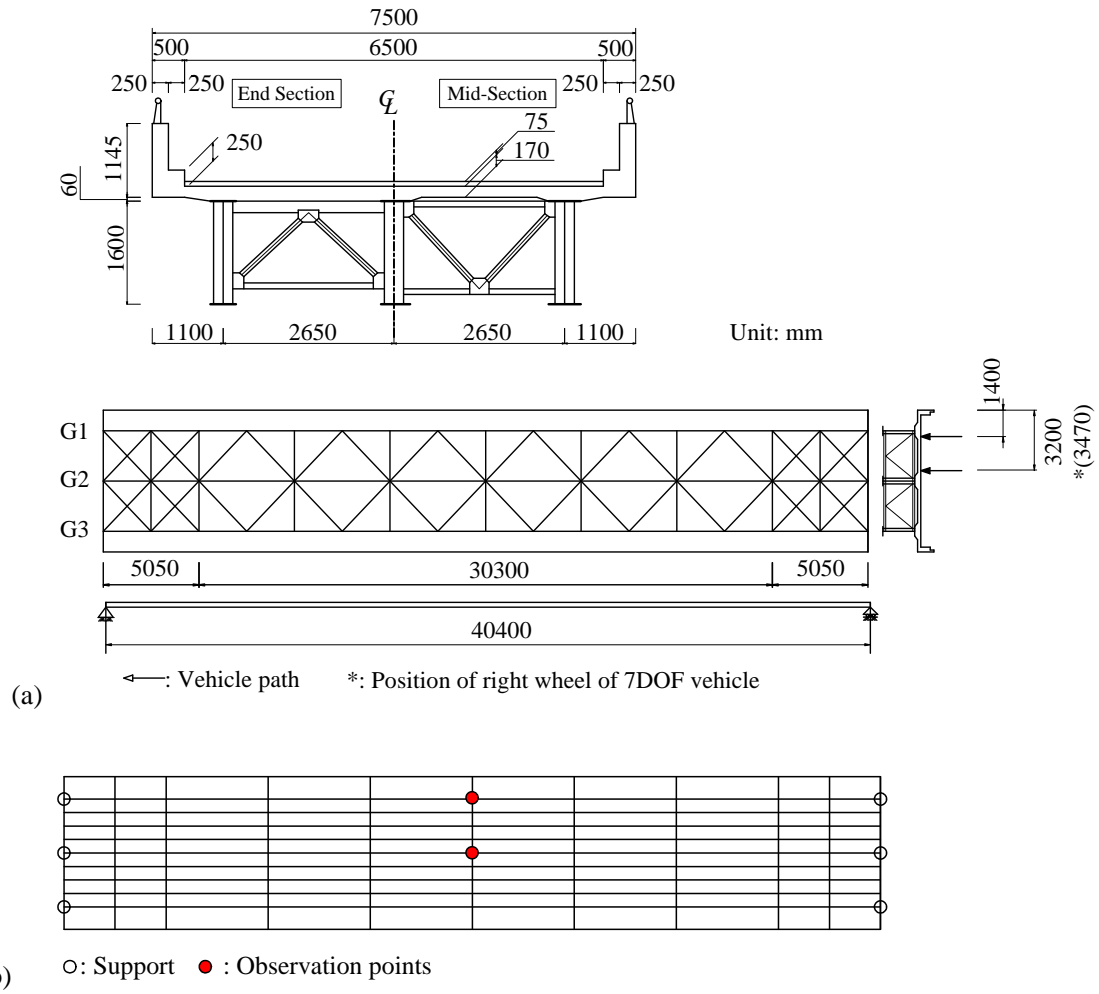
Steel plate girder bridge. (a) General layout, (b) FE model.
